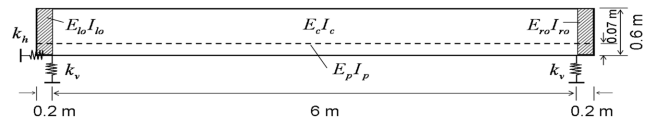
Six structural parameters for a lab-scaled PSC girder
